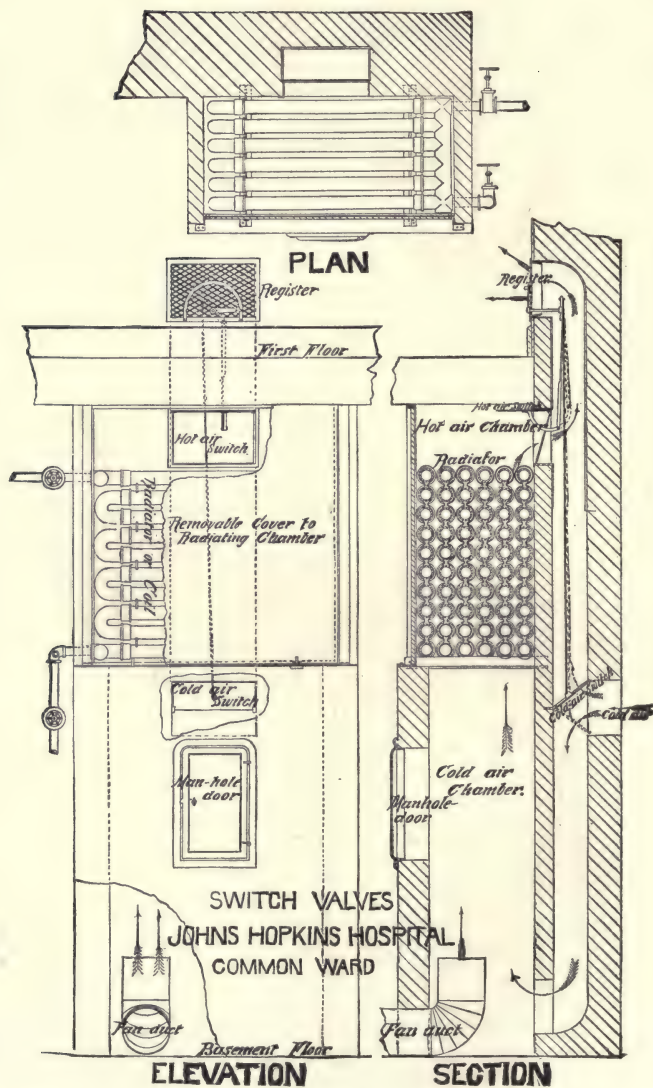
HEATING COILS AND SWITCH VALVES.—JOHNS HOPKINS HOSPITAL.
